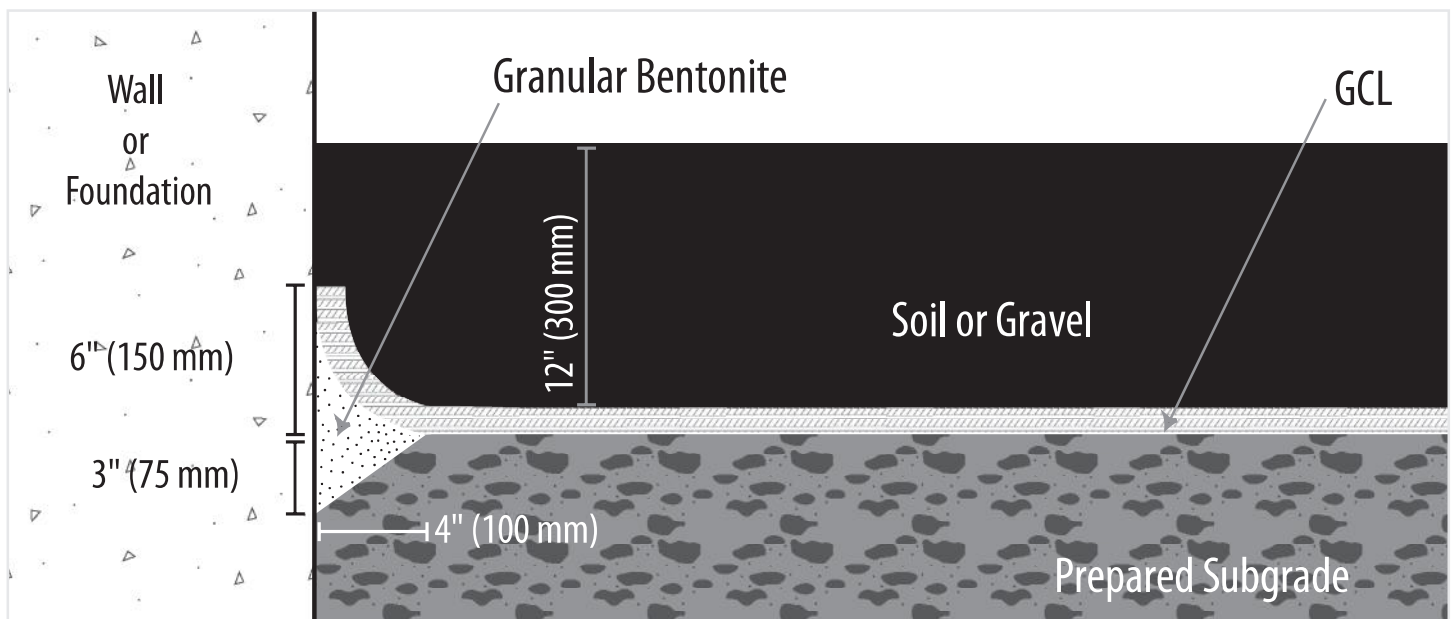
CROSS-SECTION OF GCL SEAL AGAINST AN EMBEDDED STRUCTURE OR WALL
